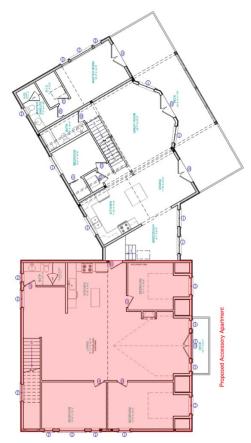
Site Plan Sketch of Main Dwelling and Accessory Apartment
